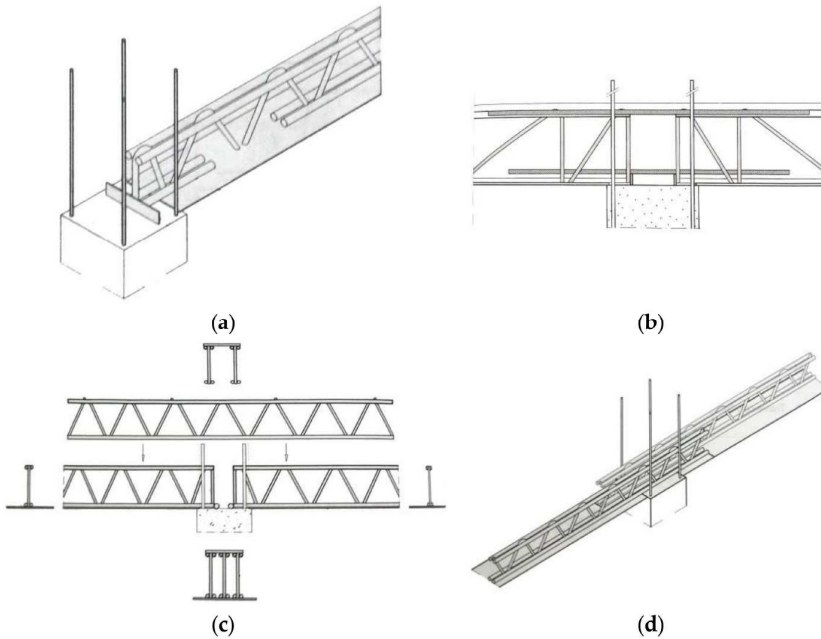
Beam-column connections for HSTC beams: bearing constituted by longitudinal bars welded on the top side of the bottom plate and connected by a vertical plate at their end section (a), added top and bottom longitudinal bars (b), added coupled trusses across the joint (c), offset of the truss within the joint (d) (taken from Colajanni et al. 2018a)
